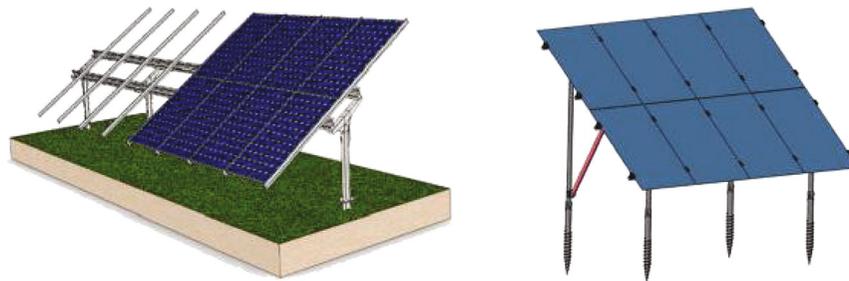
ORMPV installation: photovoltaic system in an open rack installation configuration [46].
